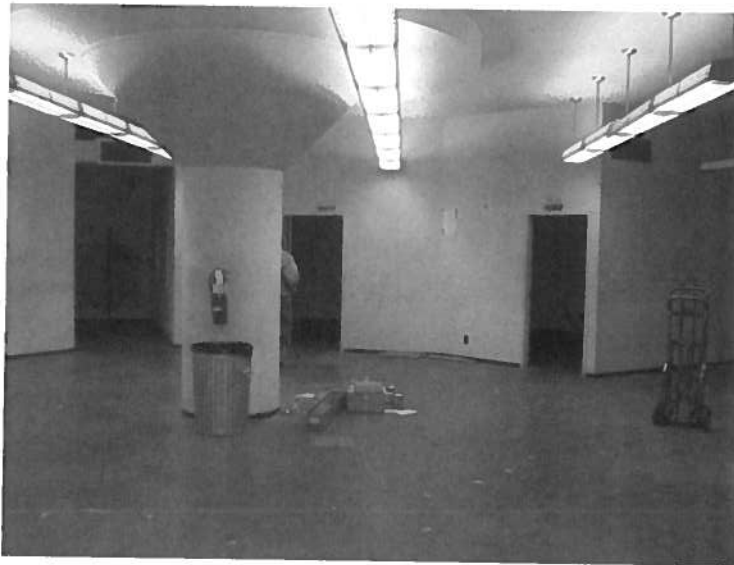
Activity area surrounding the central pillar supporting 18-in. concrete roof, 5 ft. of highway fill, and the south-bound lanes of I-5. Behind the pillar (left to right) are the escape tunnel hallway, administrative office, and emergency medical room. (Photo by Craig Holstine, WSDOT, 2010).
